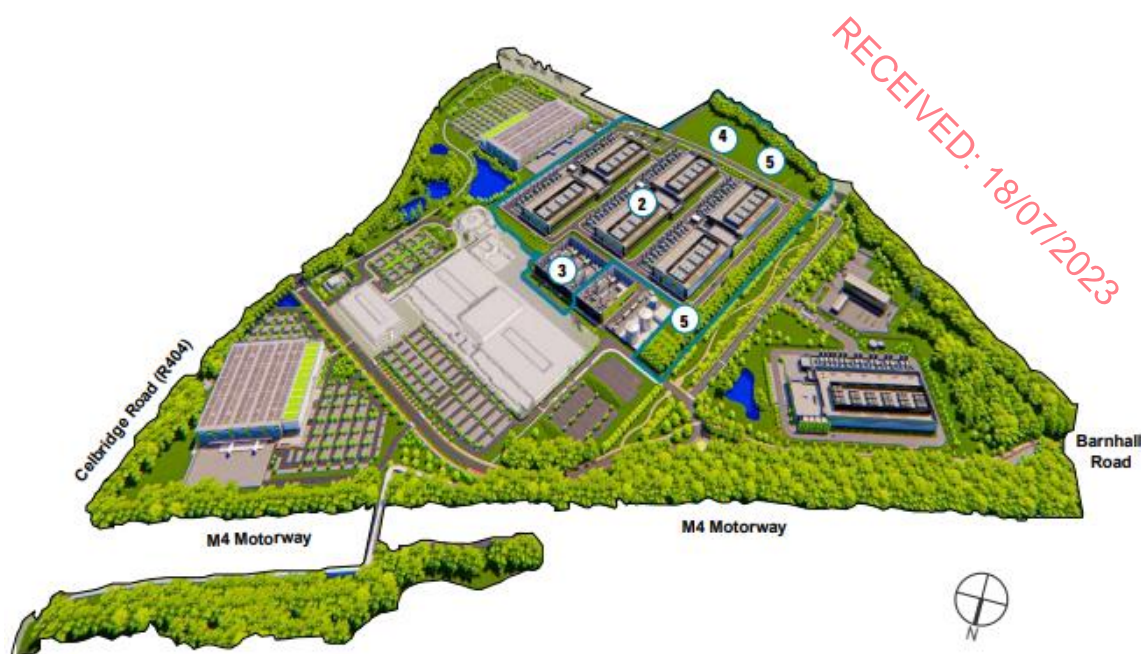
Kildare Innovation Campus Phase 3 Plan (Blue Outline). Source: RKD Architectural Design Statement
